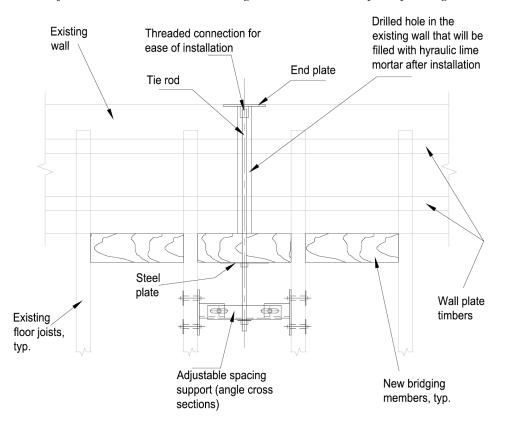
Details of the tie-rods that are connecting the exterior wall to floor framing
